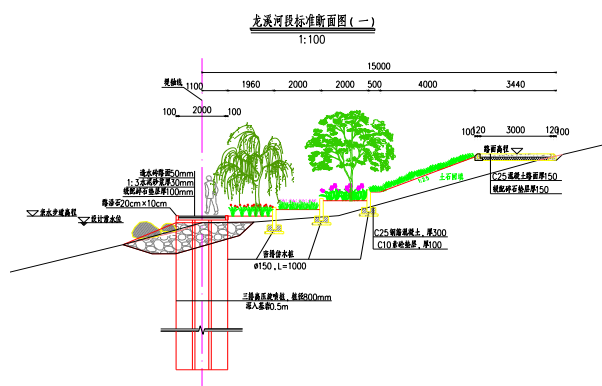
Proposed Cross Section of Longxi River (Changshou)
